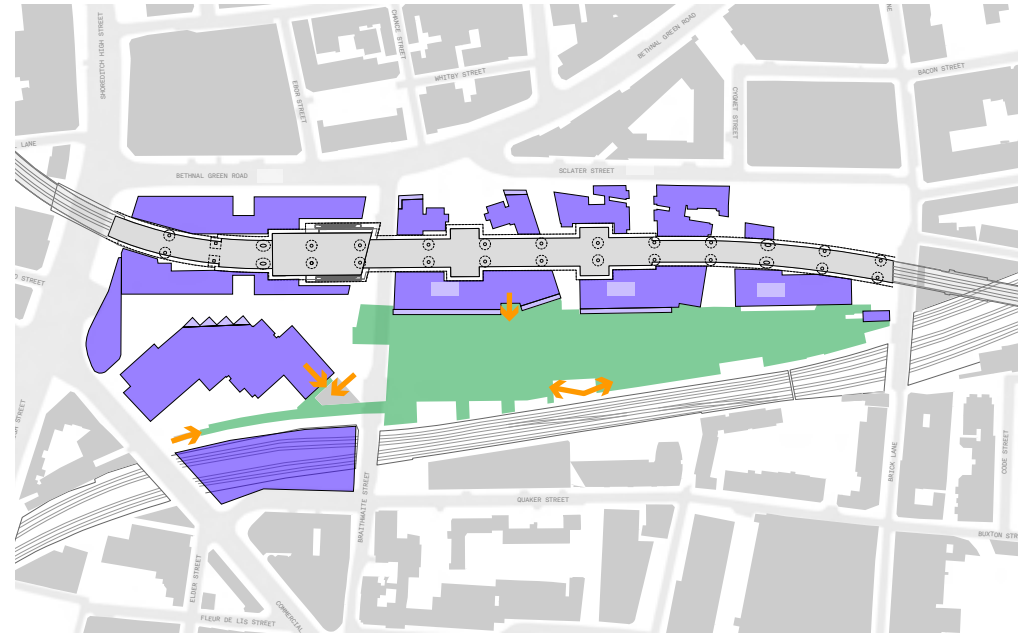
2015 Scheme: Platform Block Plan
